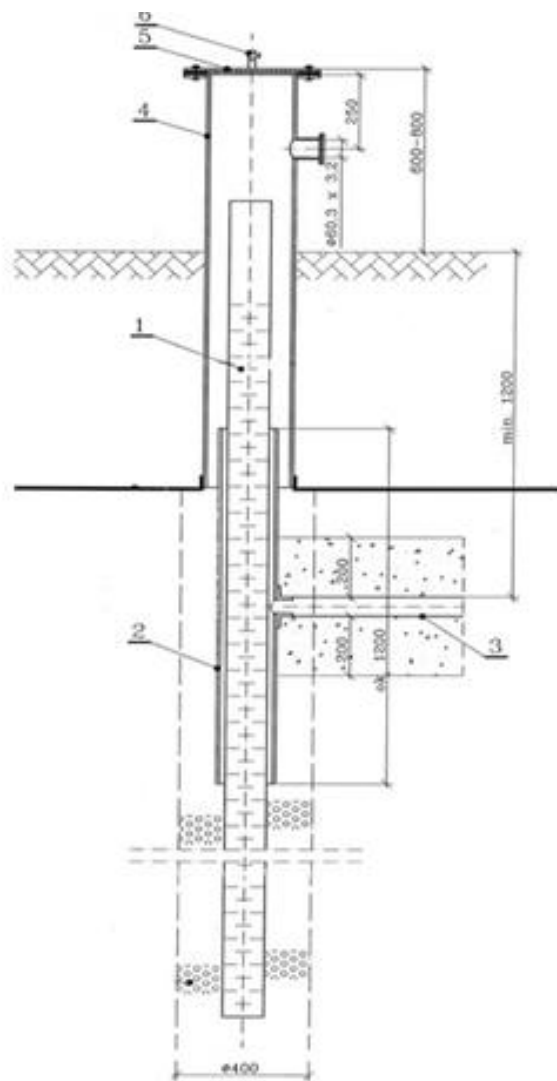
LFG well 1 - drainage pipe, 2 - casing pipe, 3 – water drainage pipe, 4 - degassing chimney 5 – cover, 6 – connection fitting (13)
